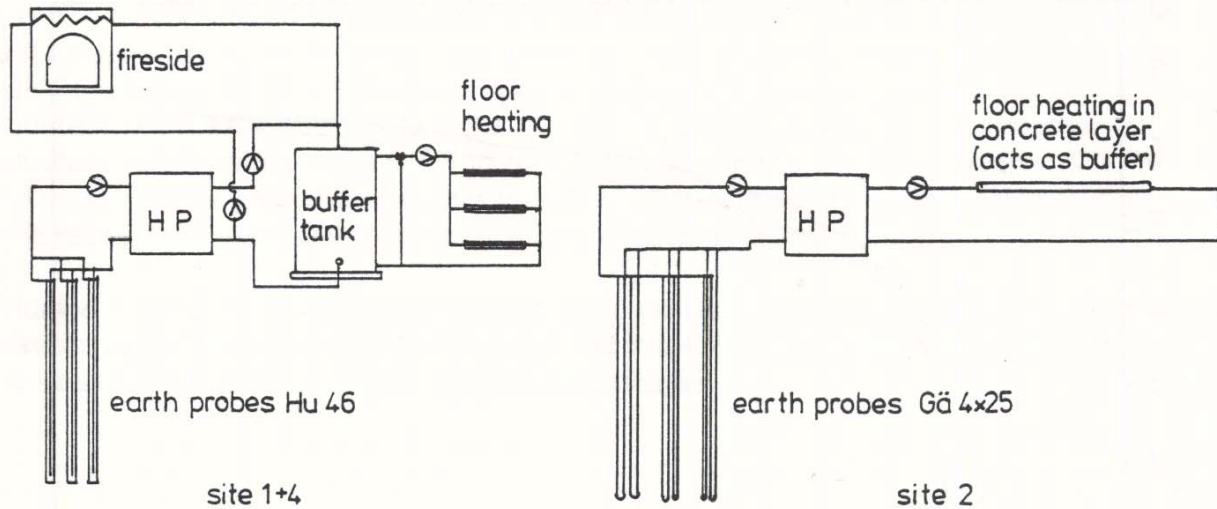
Layout of GSHP plants in site 1, 2 and 4
